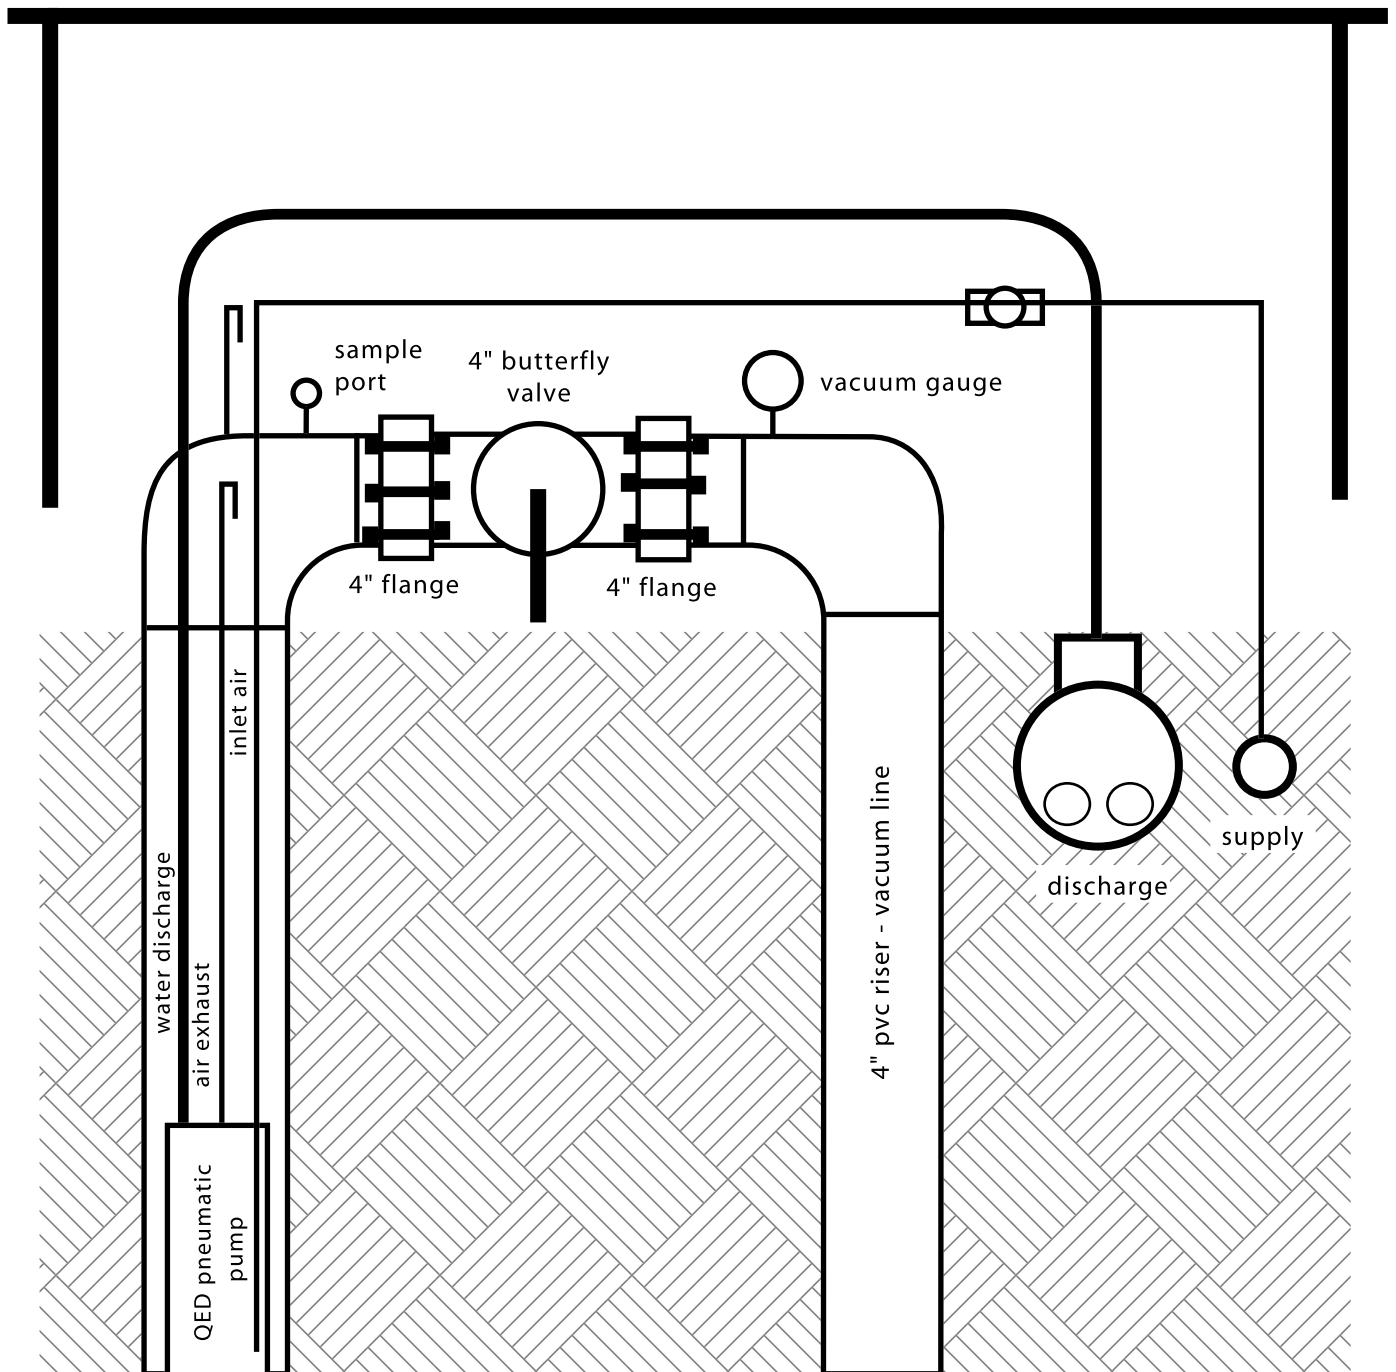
Combined Ground Water and Soil Vapor Extraction Well Head Detail - Redwood Oil Bulk Plant -
